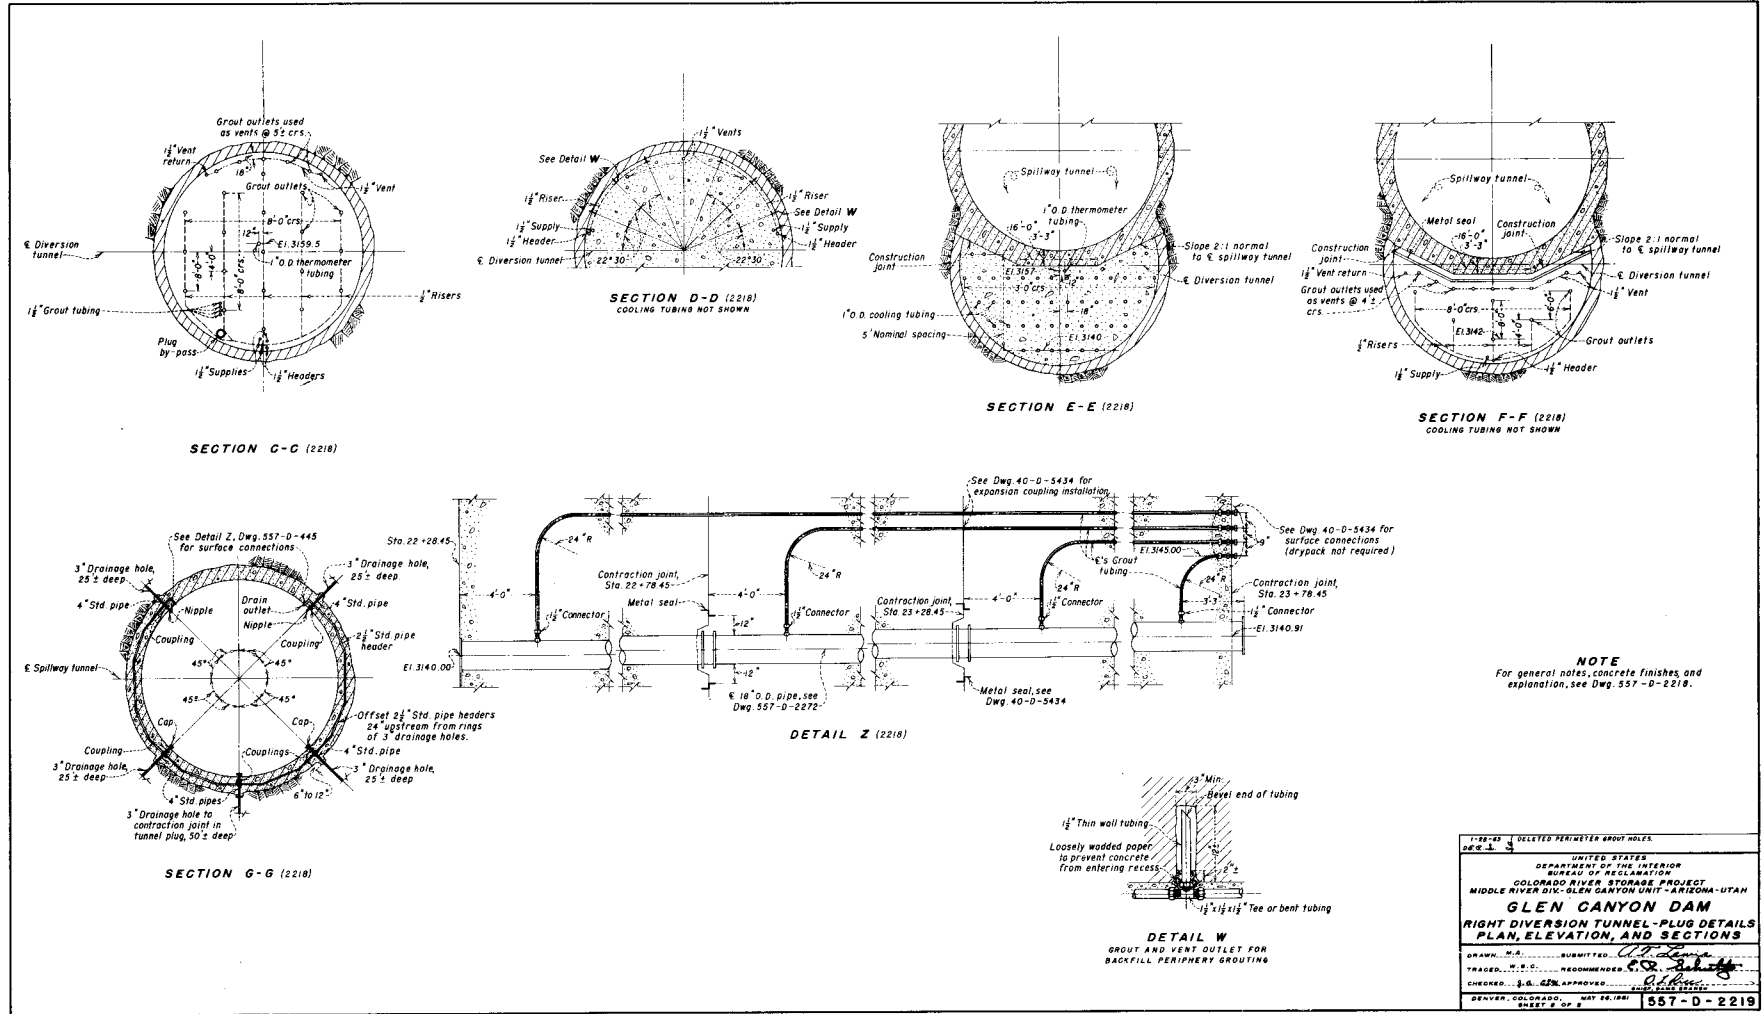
Right diversion tunnel plug details—Plan, elevation, and sections. (Sheet 2 of 2.)
